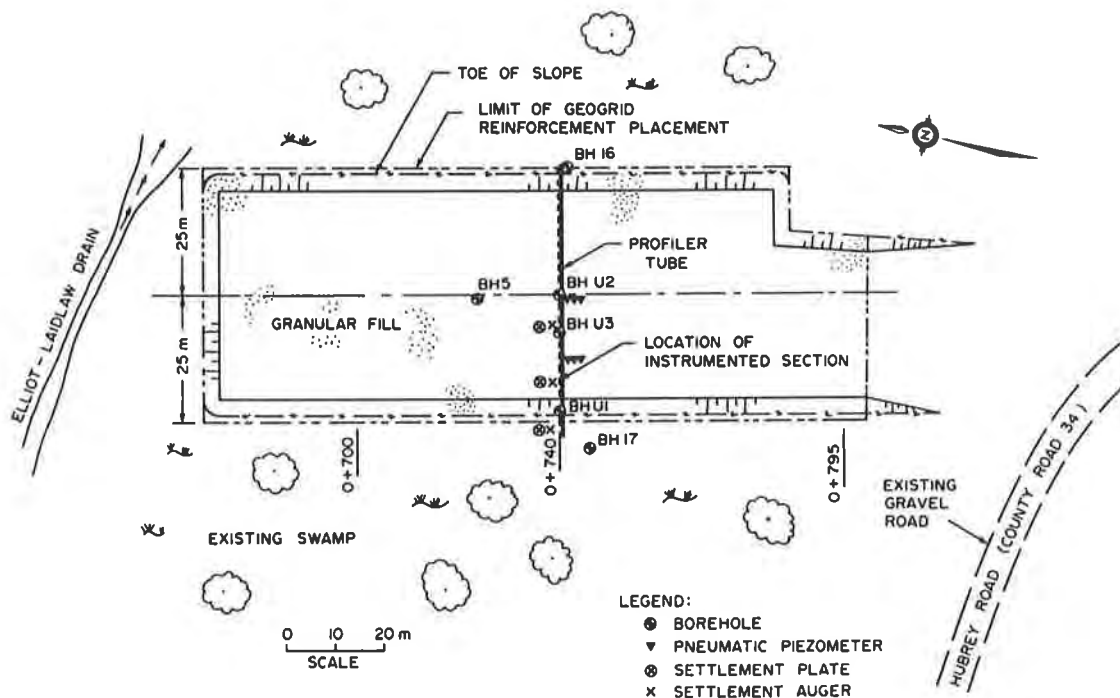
Plan Location of Instrumented Section (Chainage 0+740)
